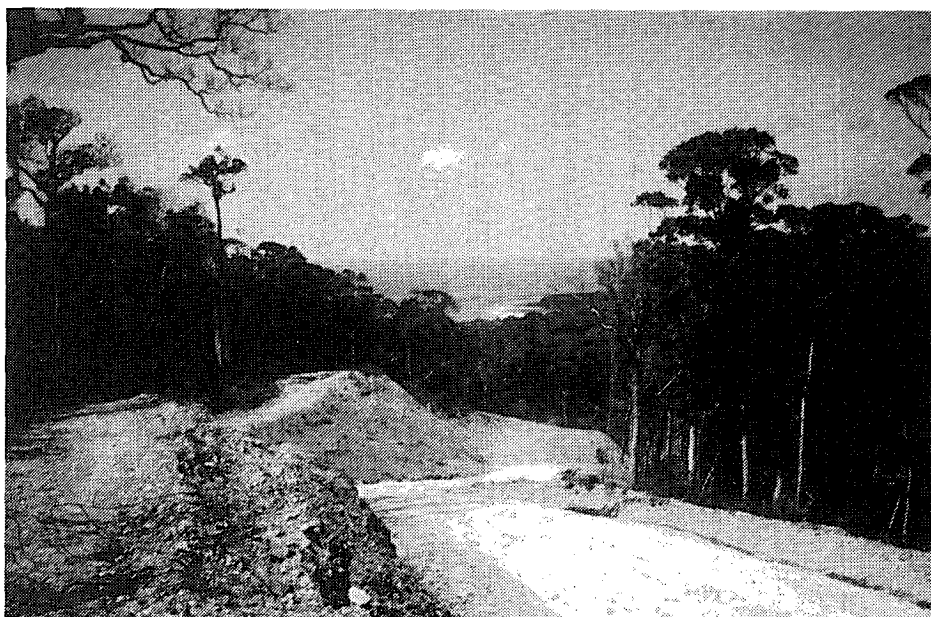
Typical road section with steep grades, unstaibilised cut and fill sections
